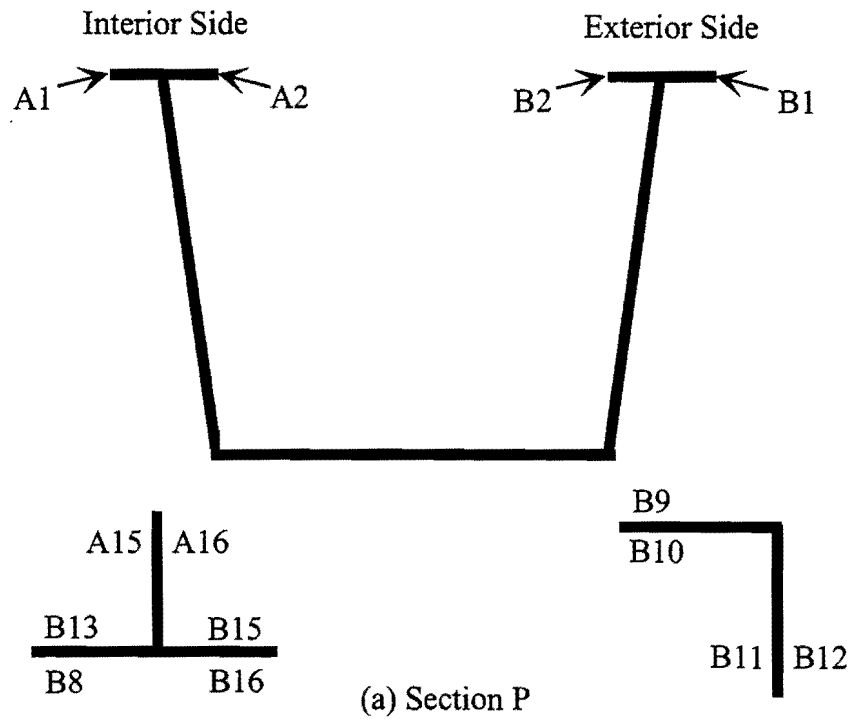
Strain Gages Used in Monitoring Girder Erection
